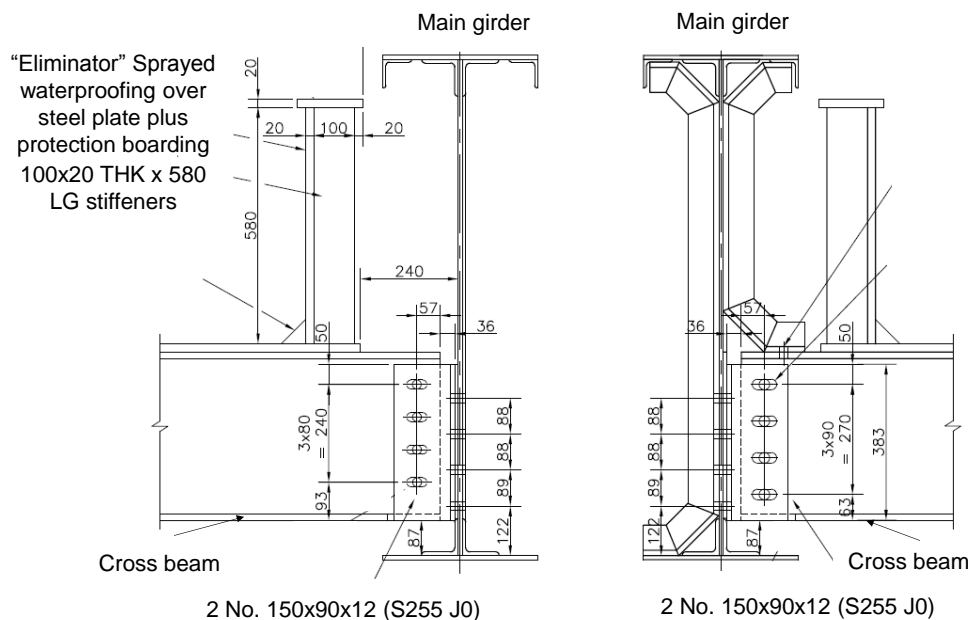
Main girder to cross beam connection details (units in millimetres) (WSR).
